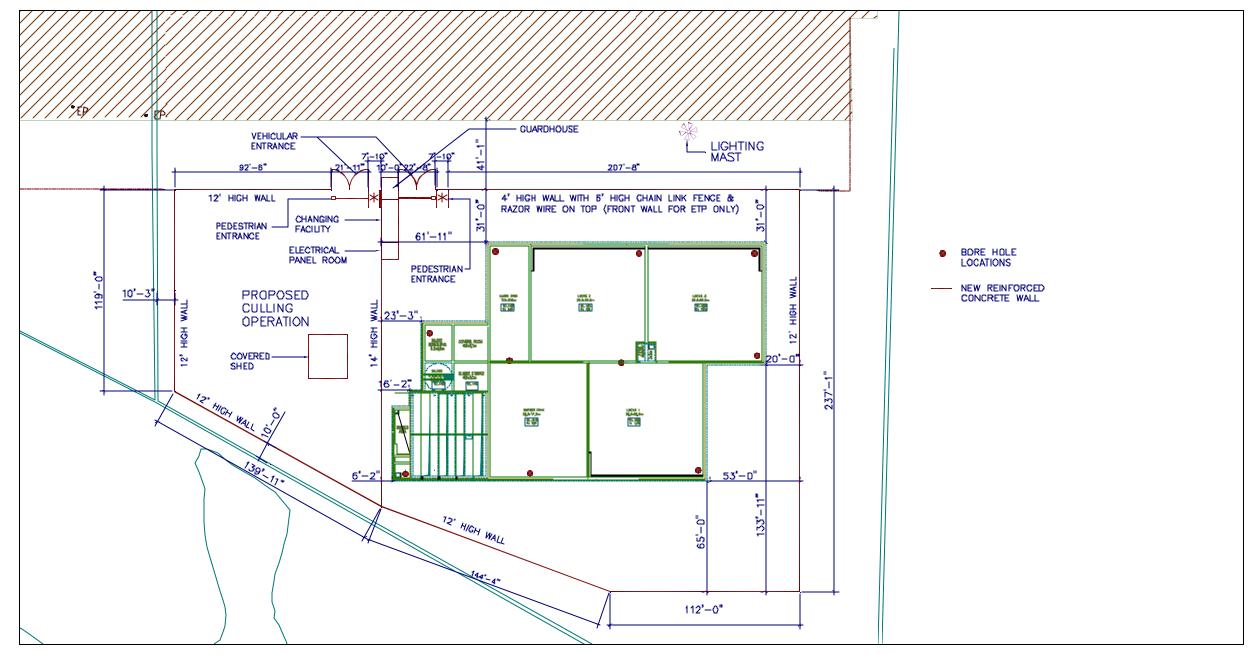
ZOOMED EXTENT OF WASTEWATER TREATMENT PLANT
